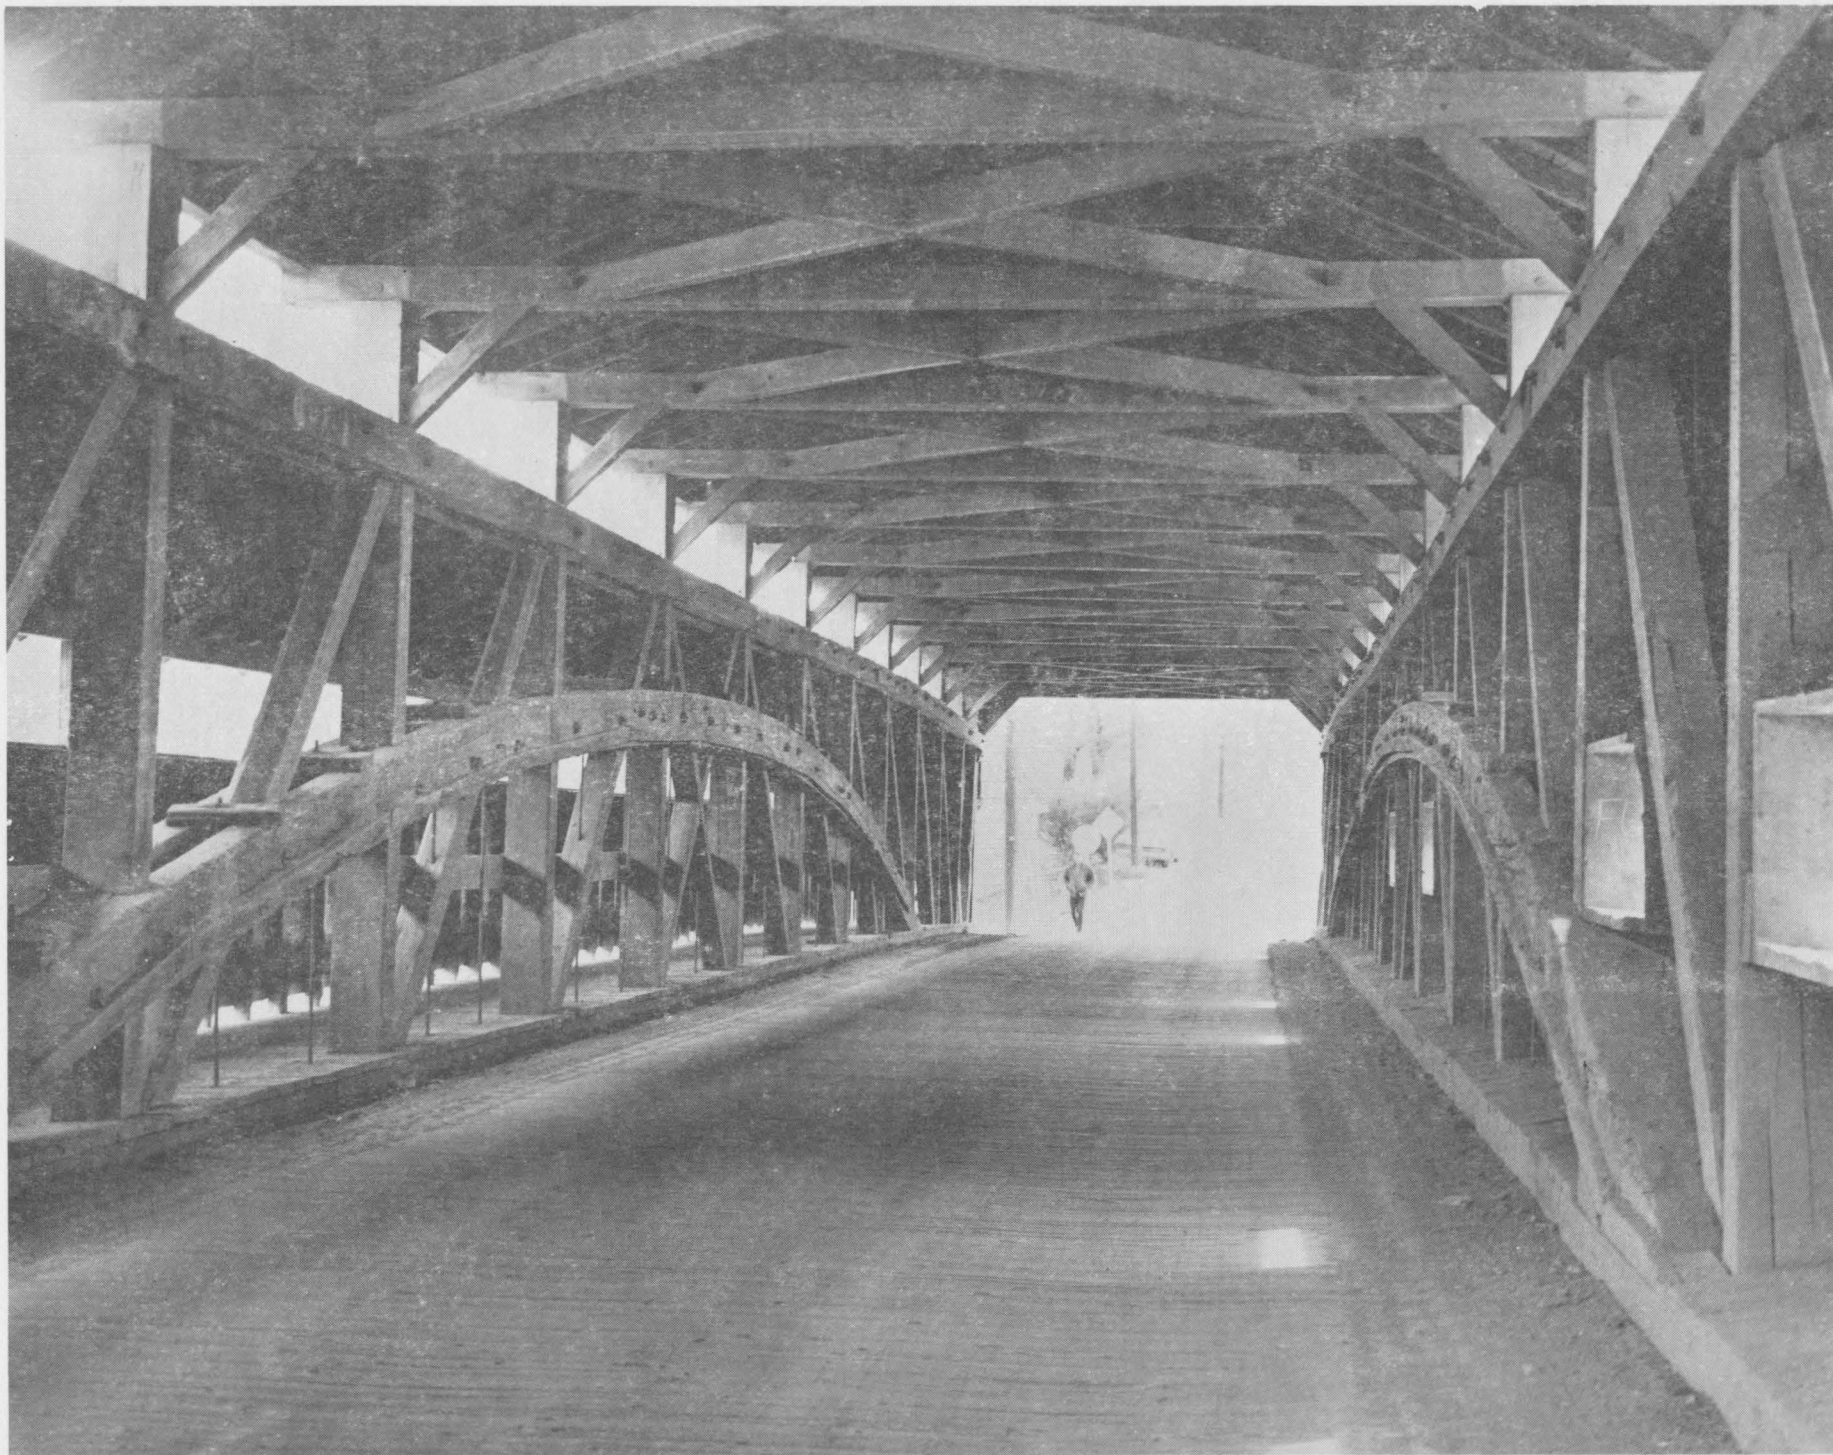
Barrackville Bridge, Interior - William E. Barrett
